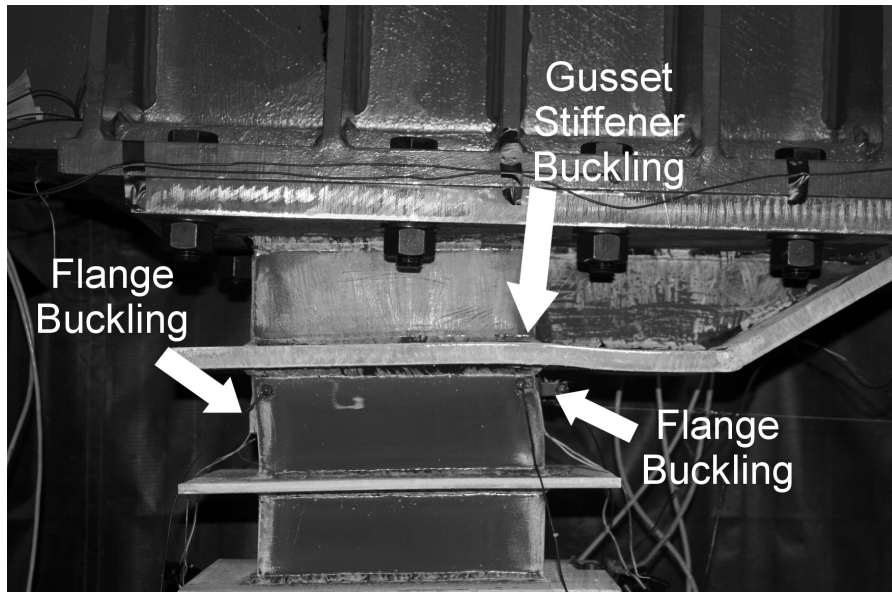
Flange and Stiffener Buckling of Specimen AX2L1.6 After Testing
